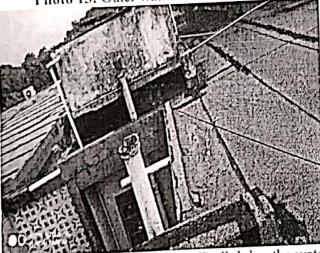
Crack on the outer wall adjoining the water tank and detrioration in the support of the water tank
